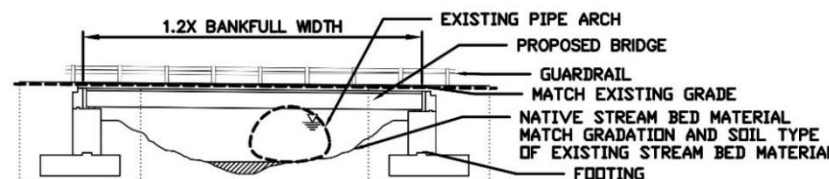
Typical detail of a bridge designed to meet the MA River and Stream Crossing Standards.
